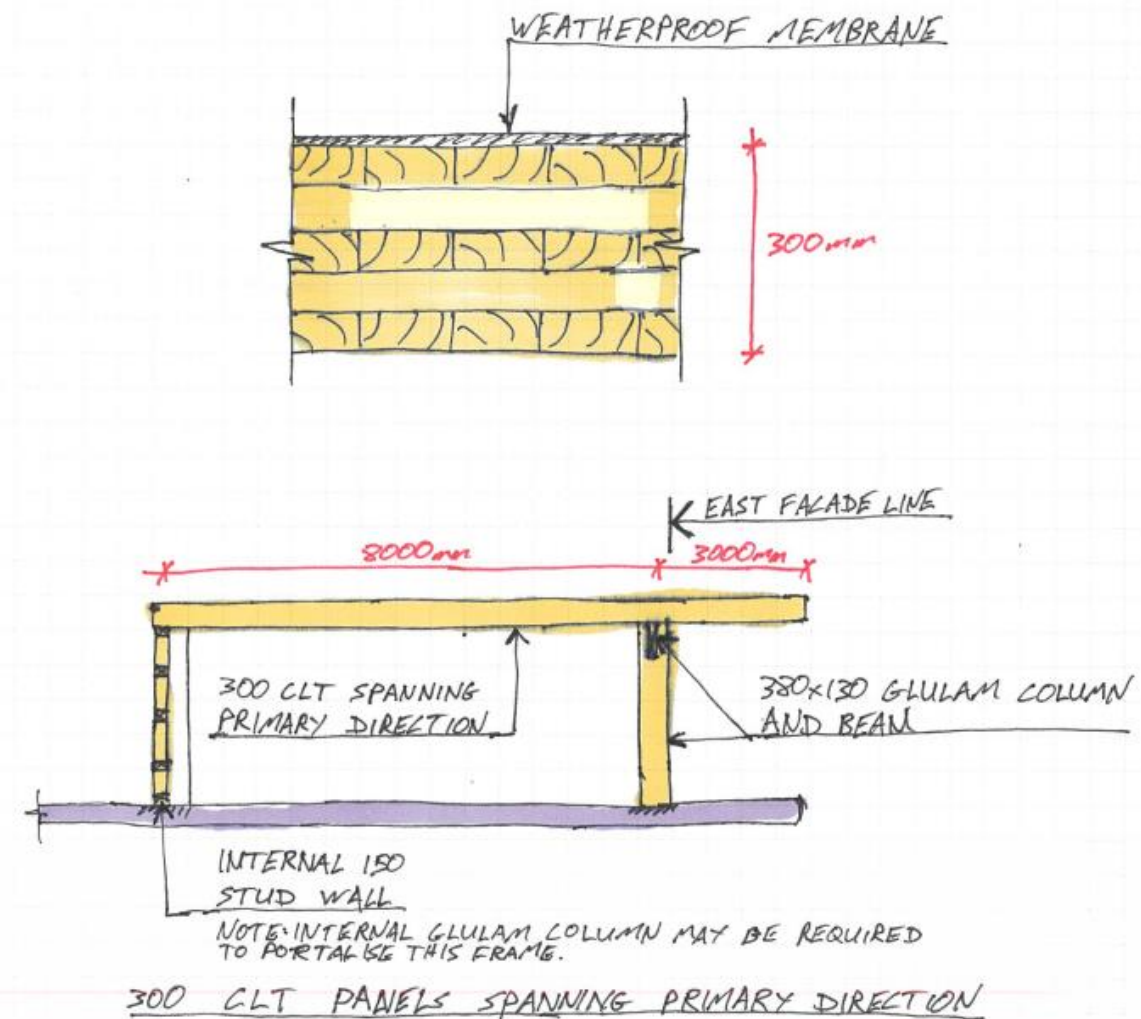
CLT Roof with Glulam Columns and Façade Line Support Beam
